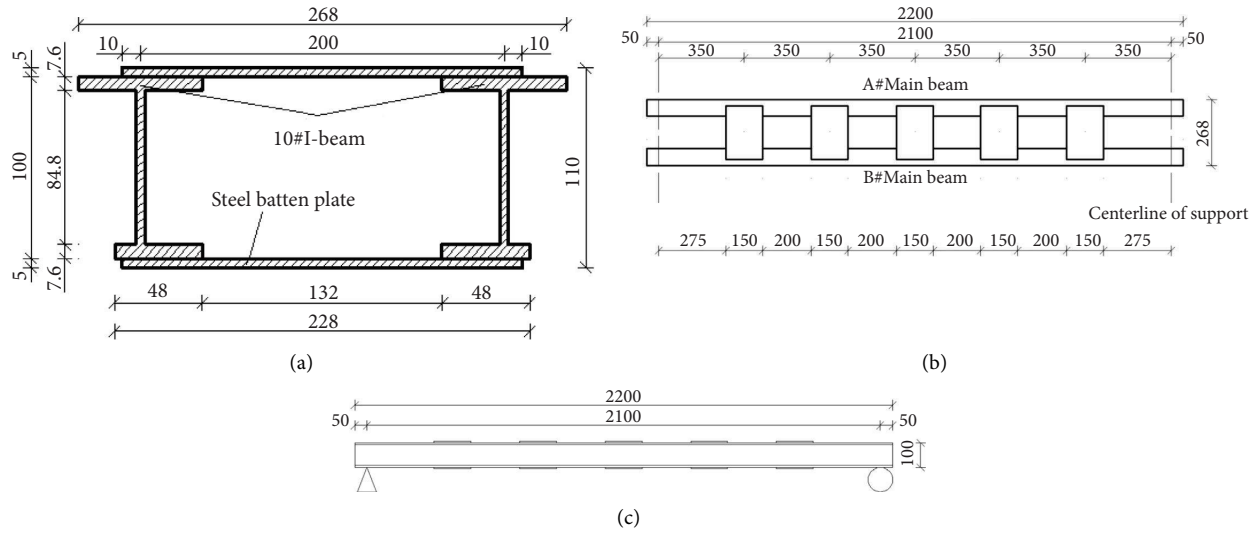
Detailed dimensions of the test structure (unit: mm). (a) Structural cross-section size. (b) Structural plane size. (c) Structural facade size.
